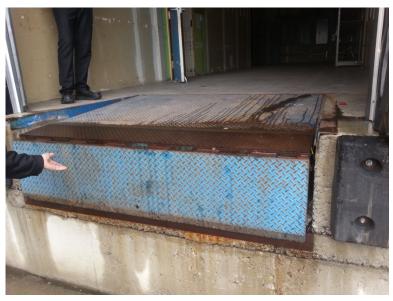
Hydraulic Lift at Loading Dock (southern side of commercial retail units).
